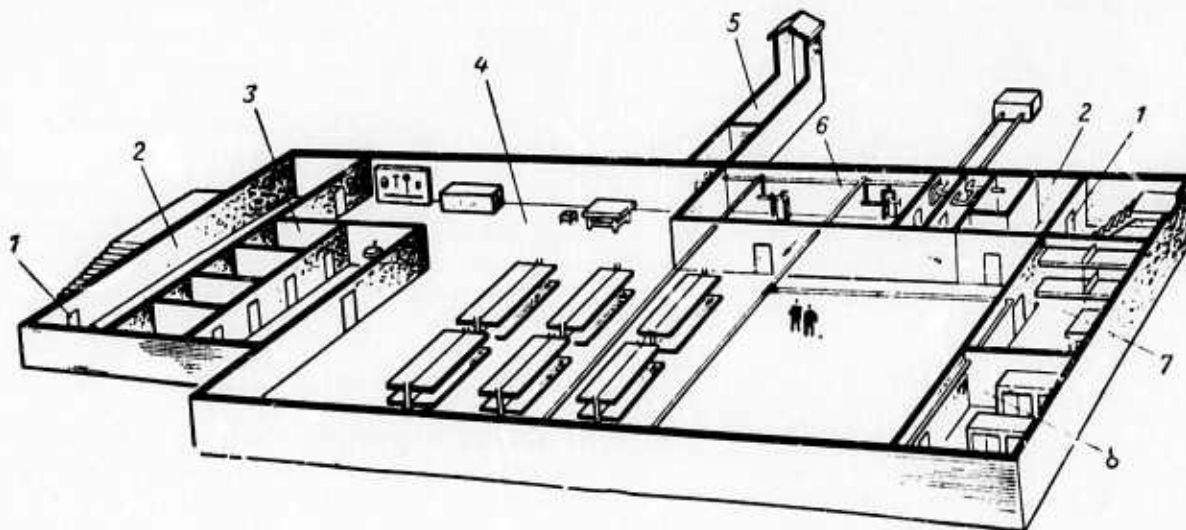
Diagram of a shelter for long-term protection from the damaging effects of weapons of mass destruction: (1) protective airtight door; (2) air lock; (3) lavatories; (4) areas for shelter occupants; (5) tunnel and vent cap of the emergency exit; (6) filter-ventilation compartments; (7) medical room; (8) storeroom for food.
